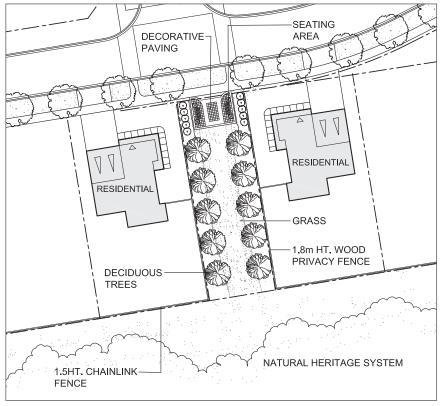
Conceptual plan of a vista block treatment with seating area and a view of the NHS to the south.
